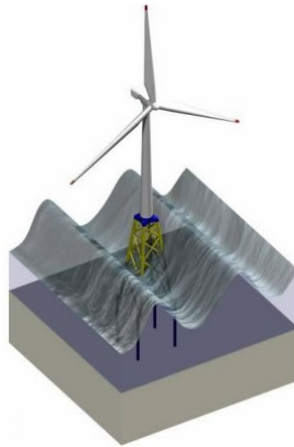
Owec tower with truss foundation in Beatrice Project [4]
